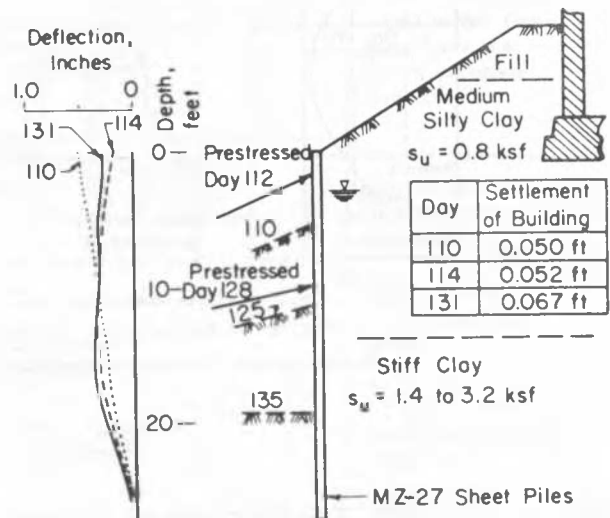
Raker Support System for Cut in Medium Clay in St. Louis, and Deflected Positions of Sheet-Pile Wall before and after Prestressing Top Raker and Shortly before Completion of Excavation
